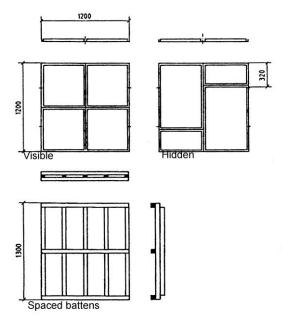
Examples of suspension of test specimen (Source: Nordtest, 1989)
